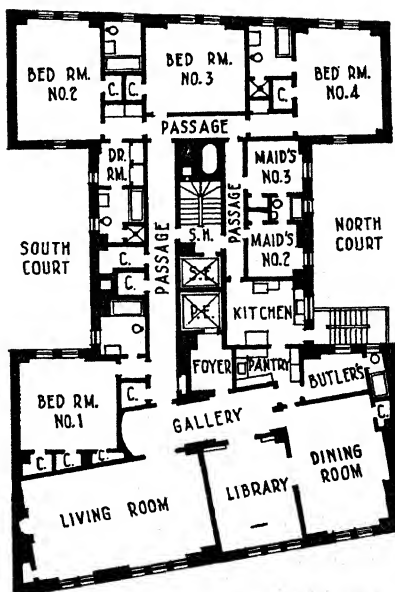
PLAN, TOWER APARTMENT, LAKE SHORE DRIVE, CHICAGO
